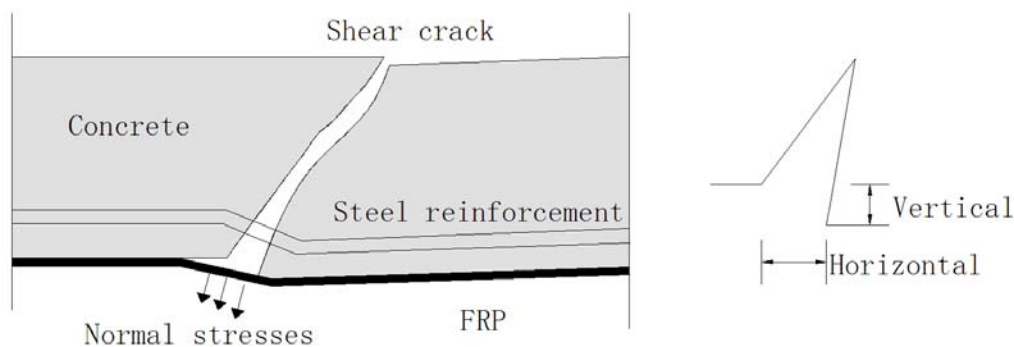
Debonding failure induced by a flexure-shear crack in the concrete beam
